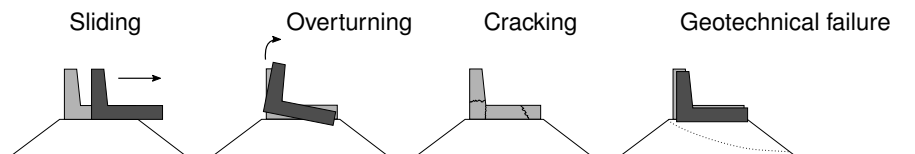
Crown wall failure modes, [PEDERSEN, 1996]
